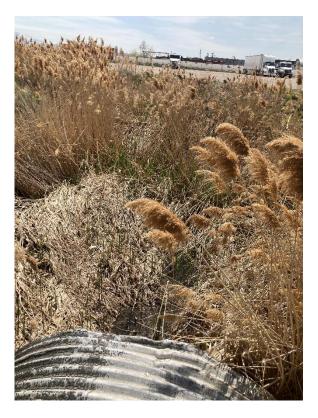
Standing on CDWB24 1-80 SB exit 9 f-ft CMP culvert looking upstream.
